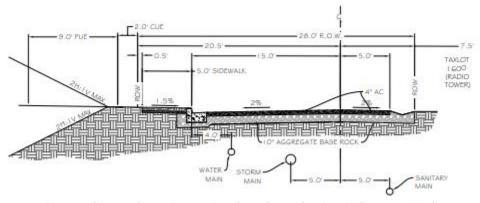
Proposed Boysenberry Avenue Local "½ -Street Section" Adjacent to Taxlot 6300
